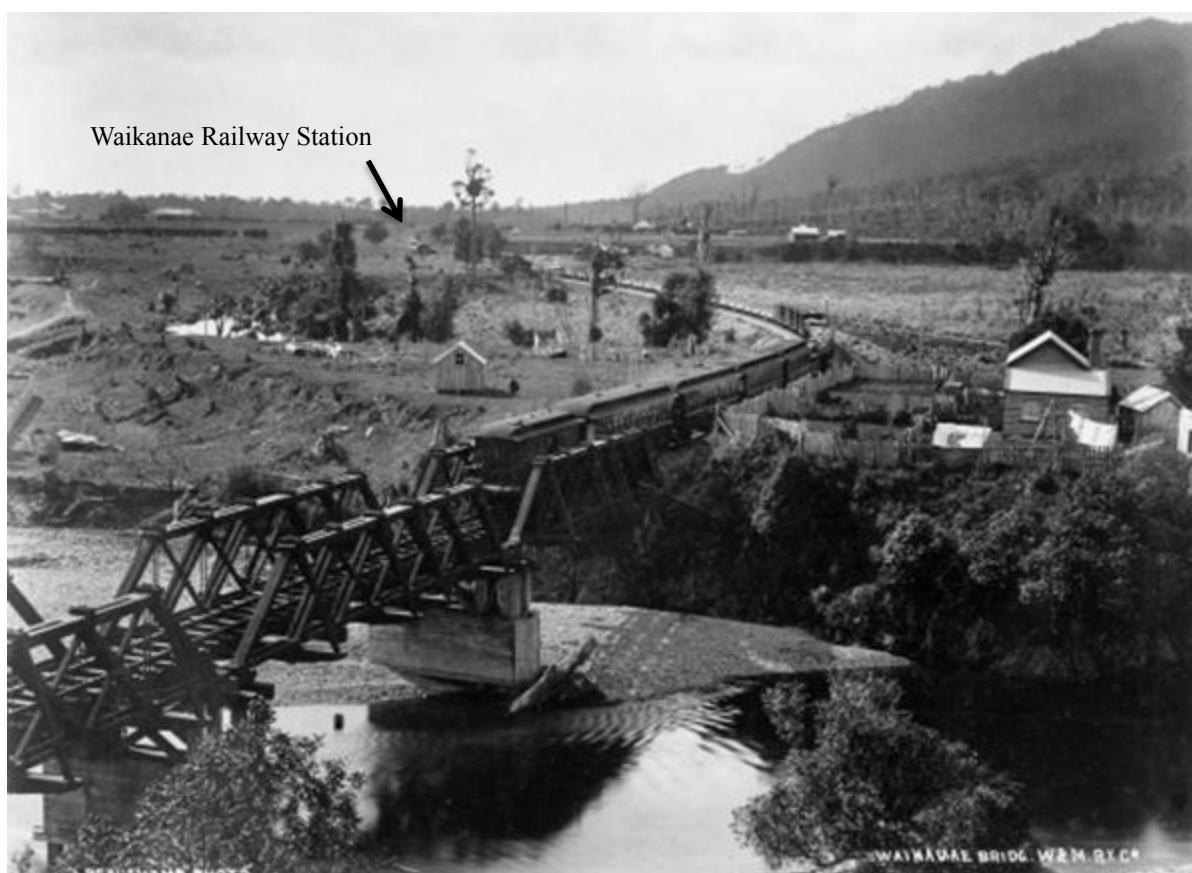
Wellington and Manawatu Railway and Waikanae bridge, 1886
